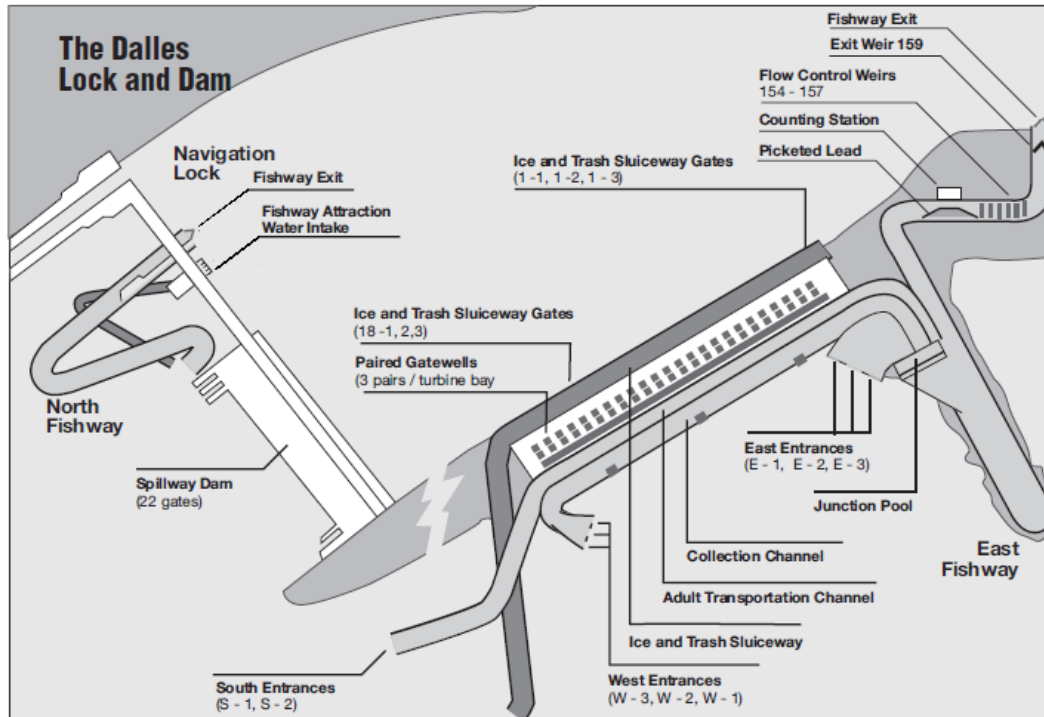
The Dalles Dam Fish Ladder System (USACE 2008)
